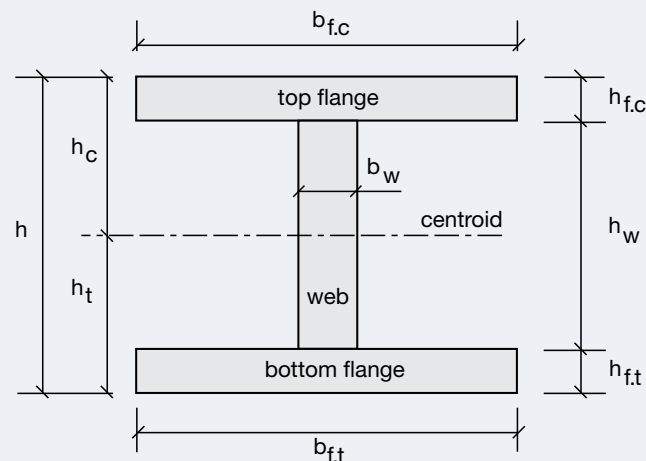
Notation for an individual 'cassette' in a typical composite timber floor design procedure.
